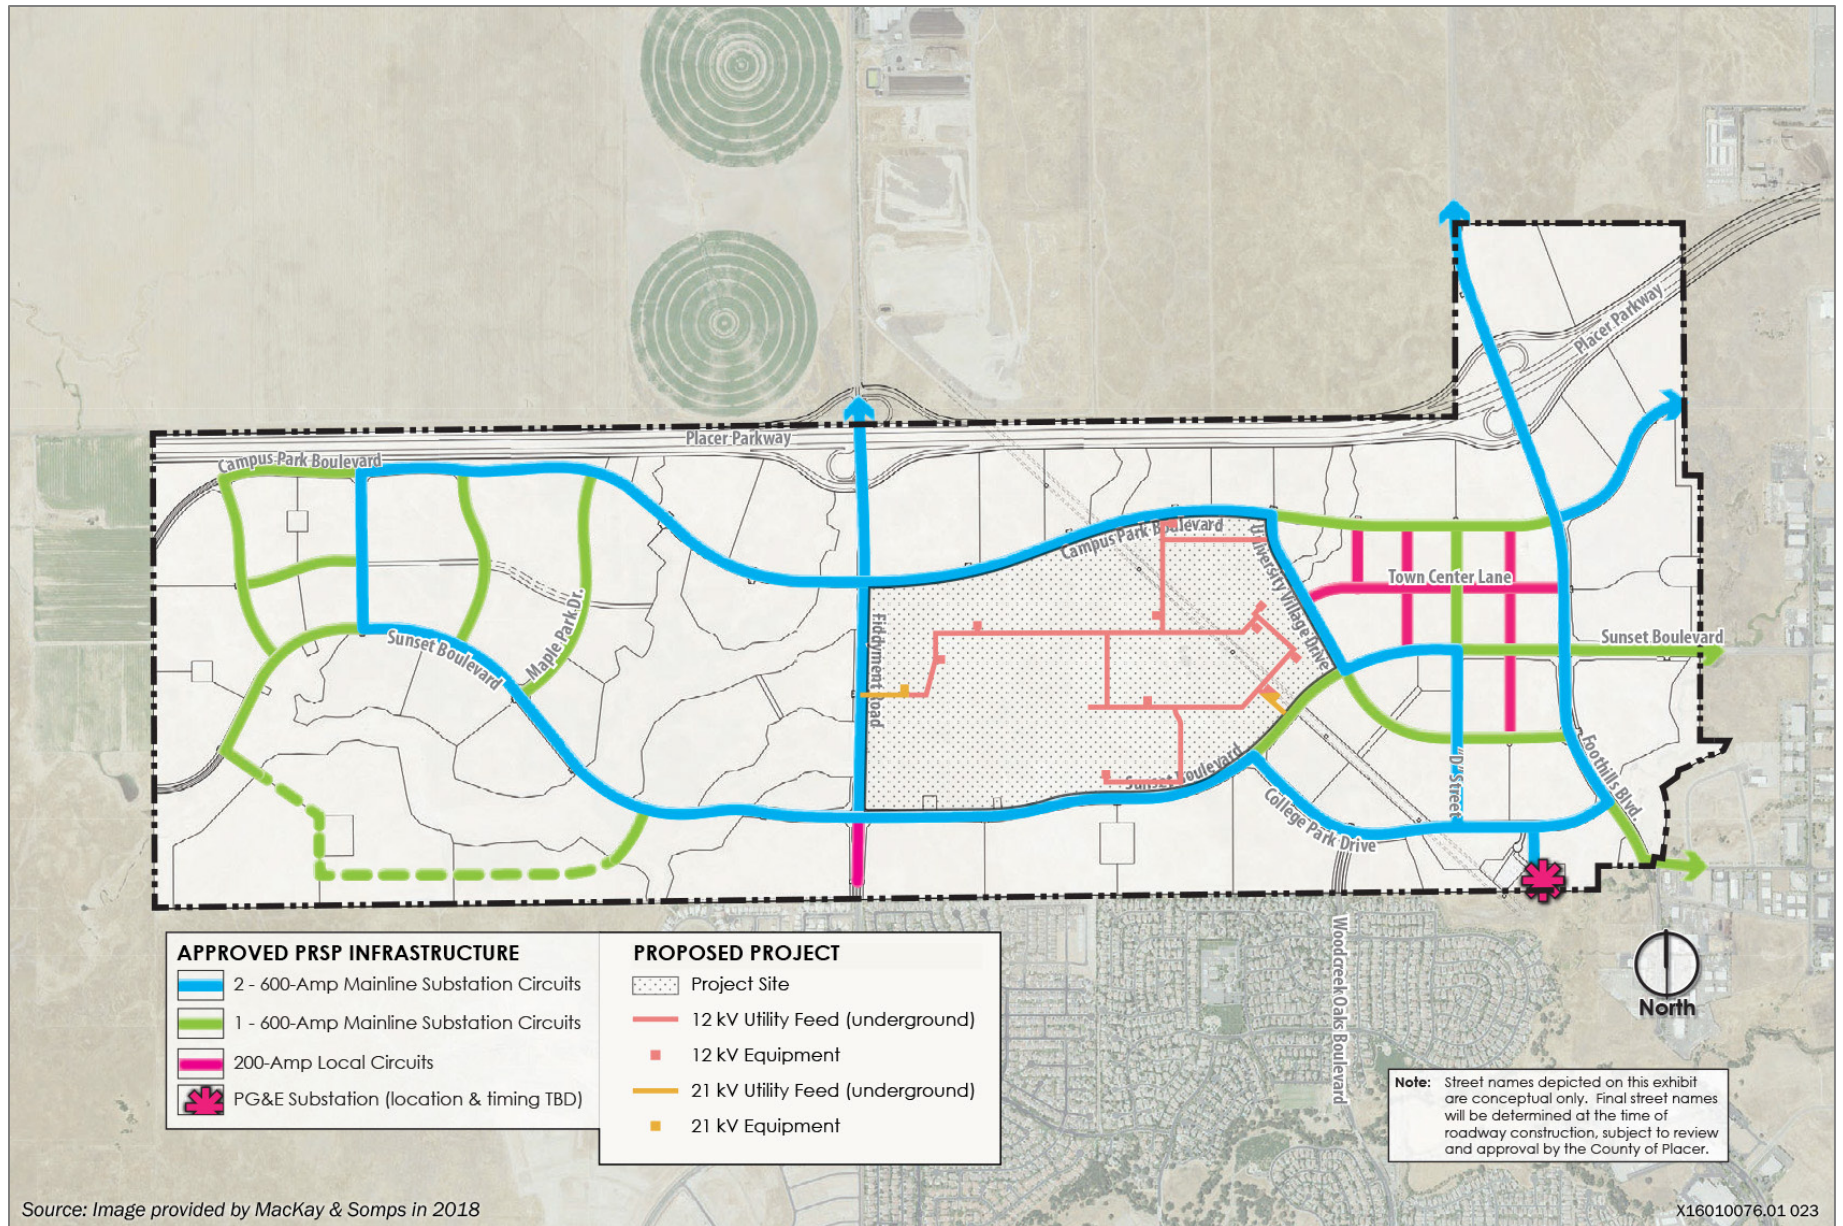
Placer Ranch Specific Plan and Sacramento State – Placer Center Electrical Infrastructure
